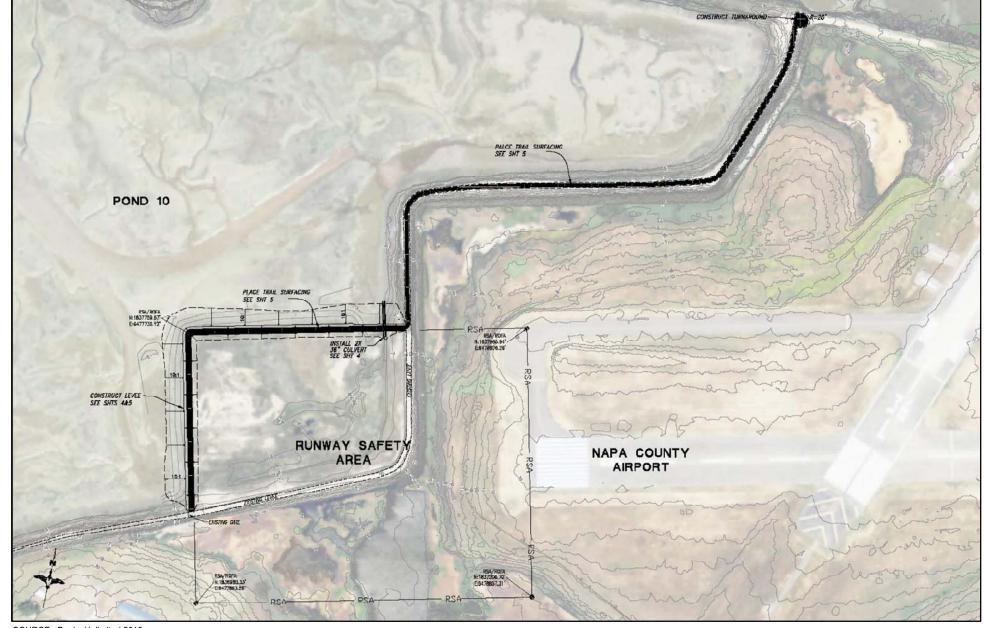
Proposed Project and Vicinity Napa Plant Site Pond 9/10 Trail Project
